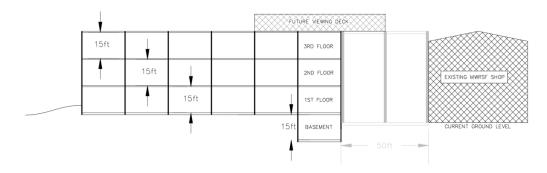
Side Profile of New and Existing Proposed Buildings (Looking from South)
